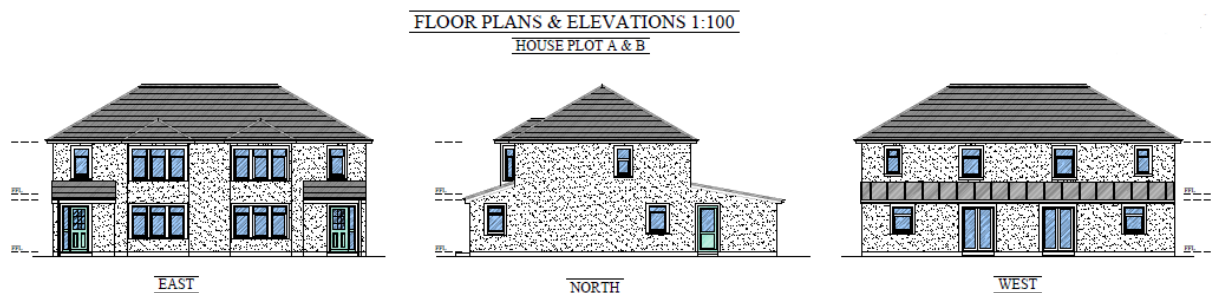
Proposed East Elevation (Plots A and B) – Extract from Plan 03 (not to scale)
